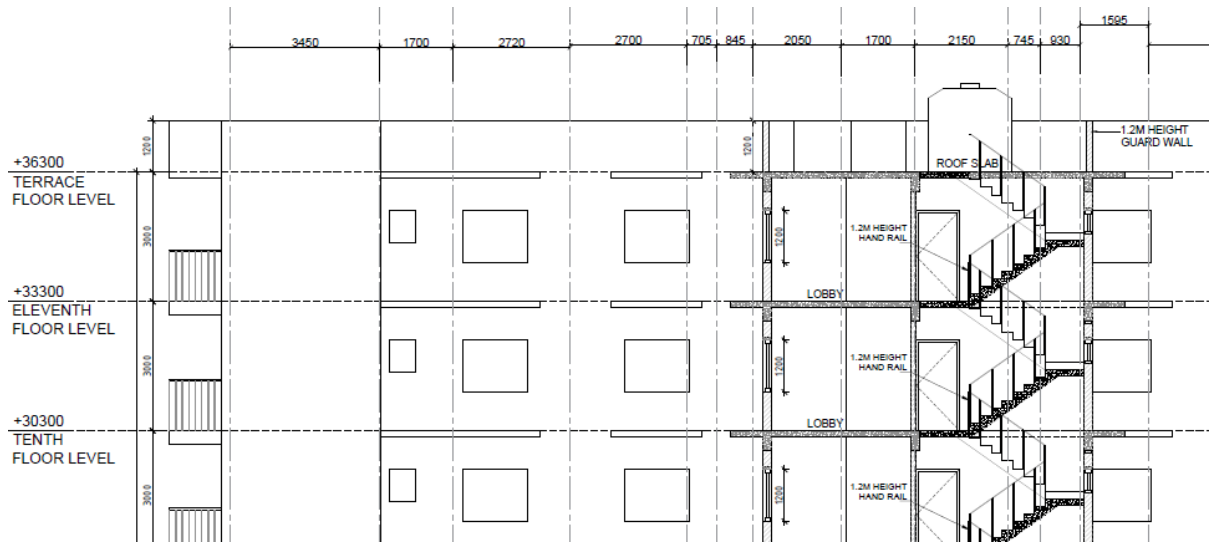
55:Terrace floor 36.3 m height (Water tank and 1.2 m height guard wall)
